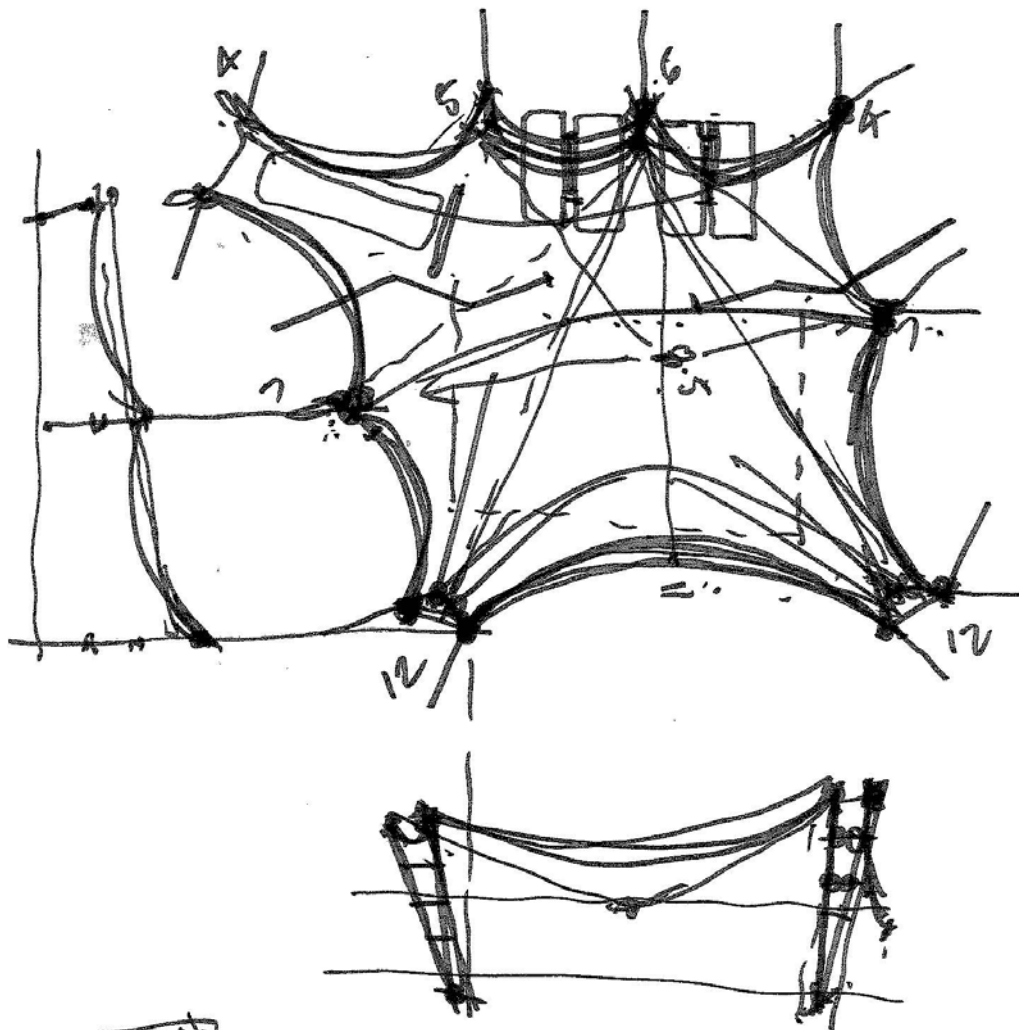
Daryl Jackson Plan and Elevation Sketch 04/12/07
